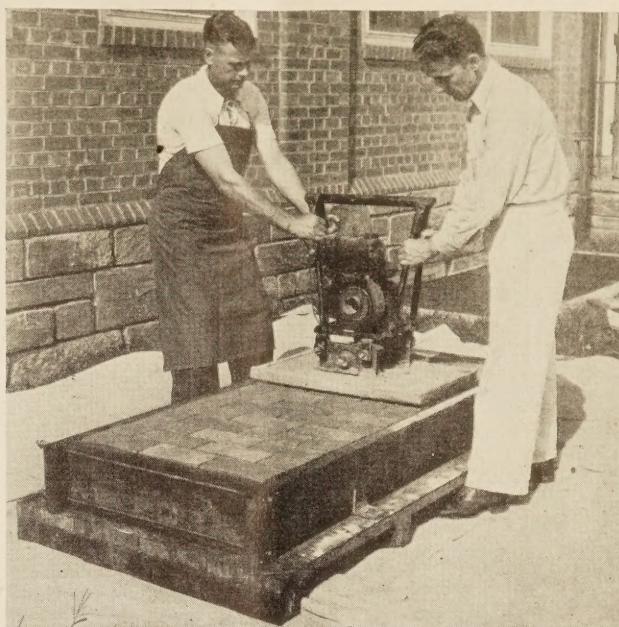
VIBRATOR USED FOR COMPACTING PLAIN CONCRETE AND MONOLITHIC BRICK SLABS.
